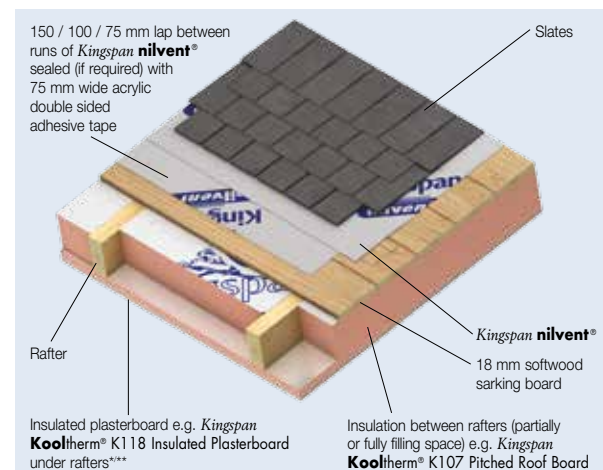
Insulation Between Rafters – Sarking Board & Natural Slates
